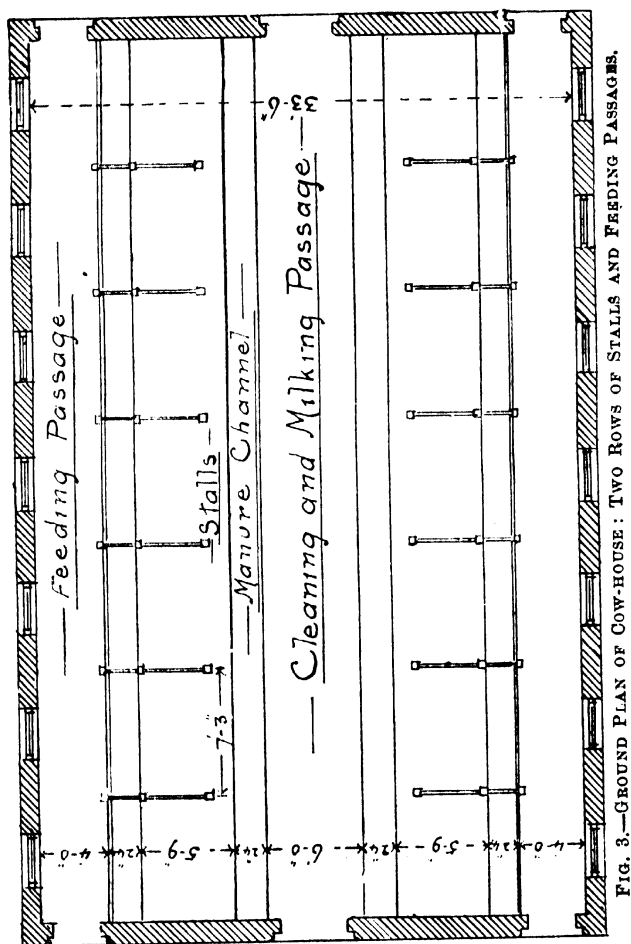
GROUND PLAN OF COW-HOUSE: TWO ROWS OF STALLS AND FEEDING PASSAGES.
